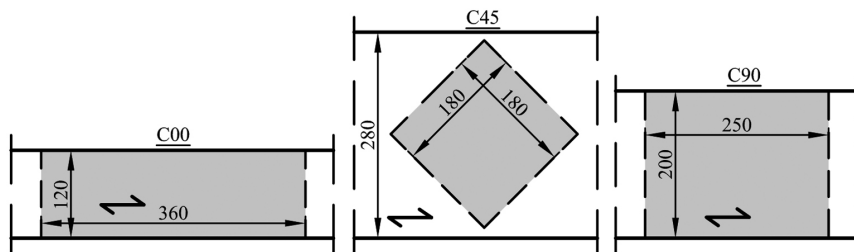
Cutout direction and dimensions of C00, C45 and C90 samples, in millimeters
